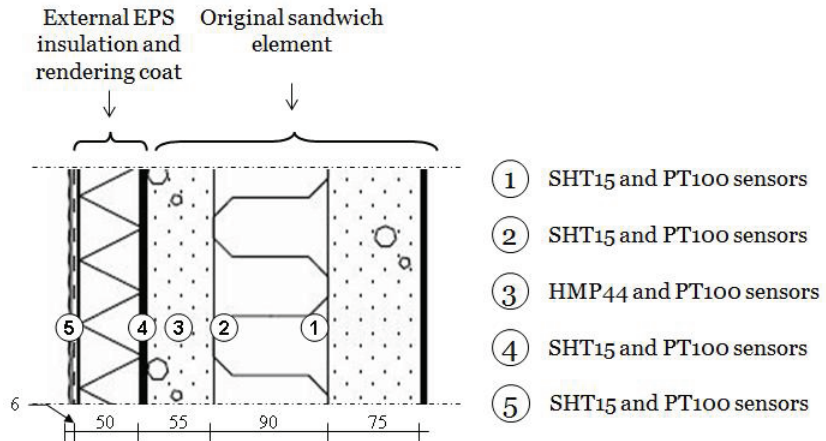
Cross-section and location of the monitoring sensors in the concrete building facade RF1-EPS
